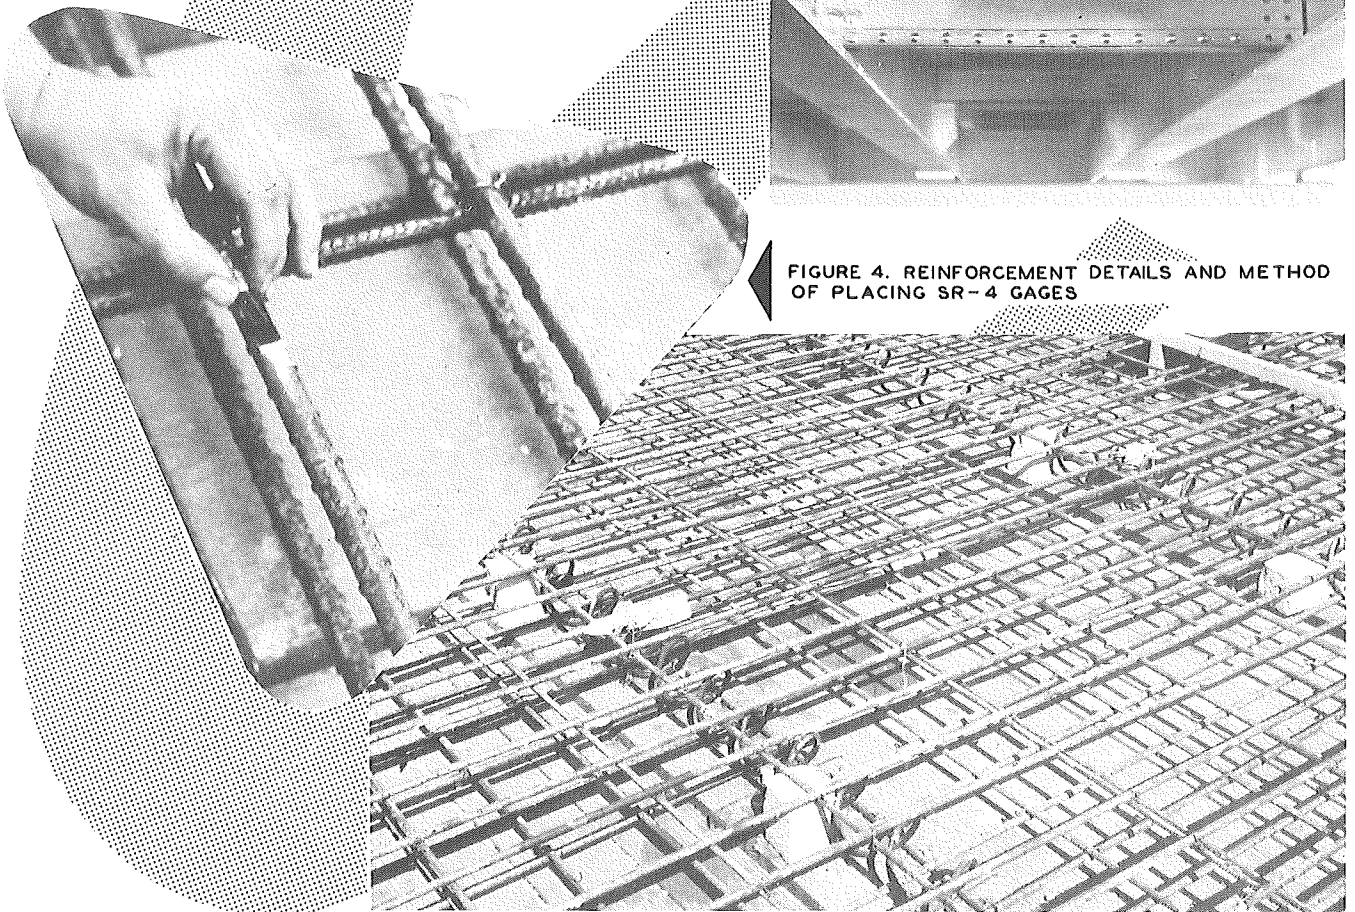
REINFORCEMENT DETAILS AND METHOD OF PLACING SR-4 GAGES
